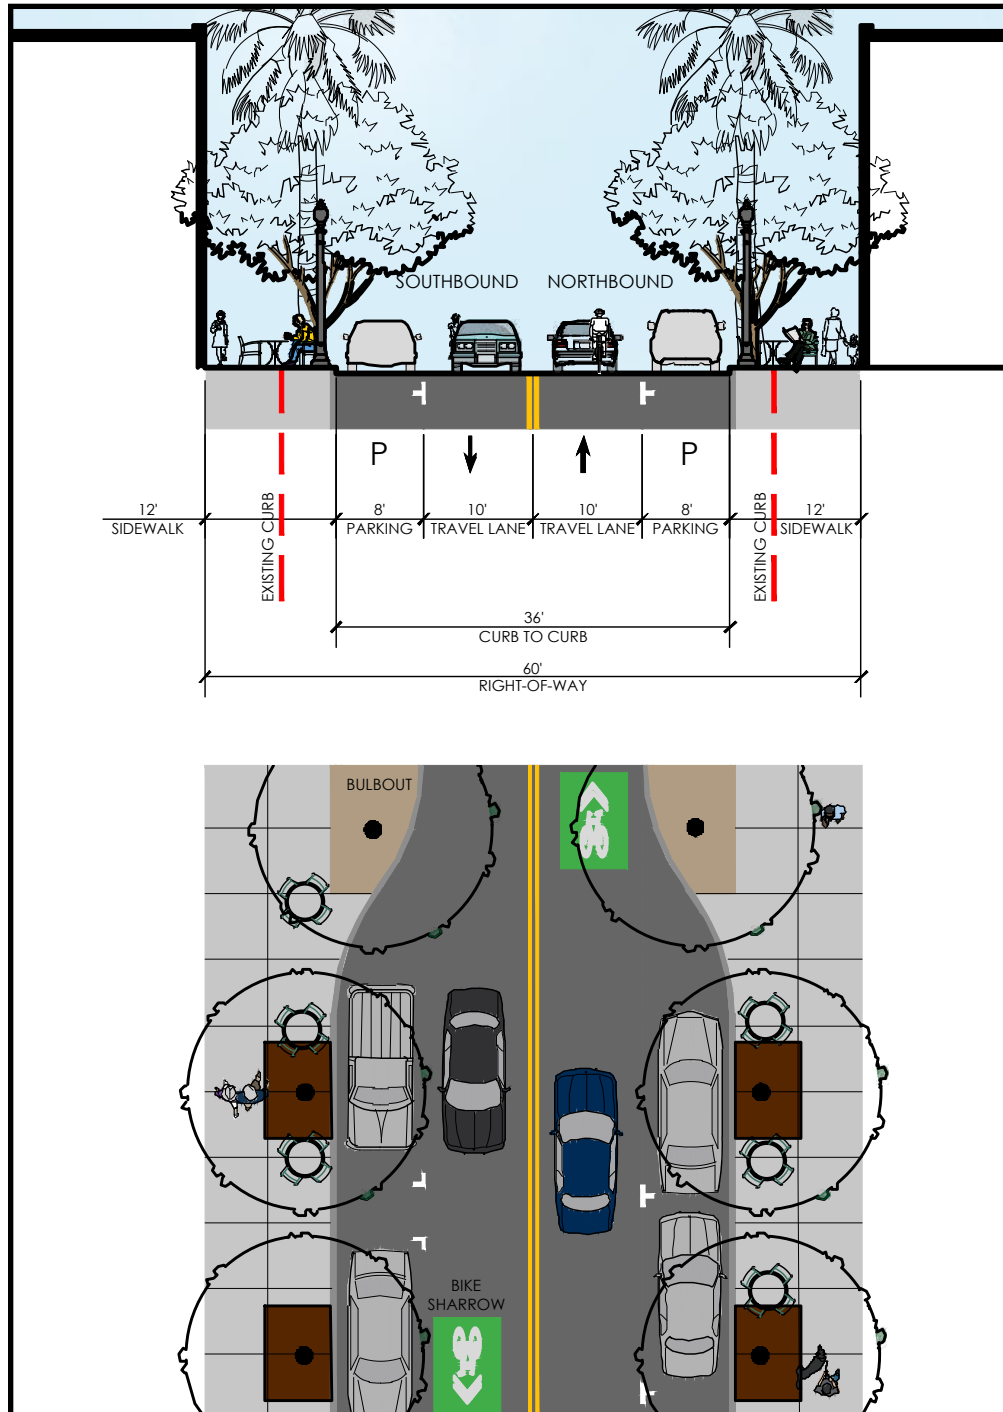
, State Street: Proposed Conditions Plan - North of Christiansen Avenue and South of Carlsbad Village Drive
